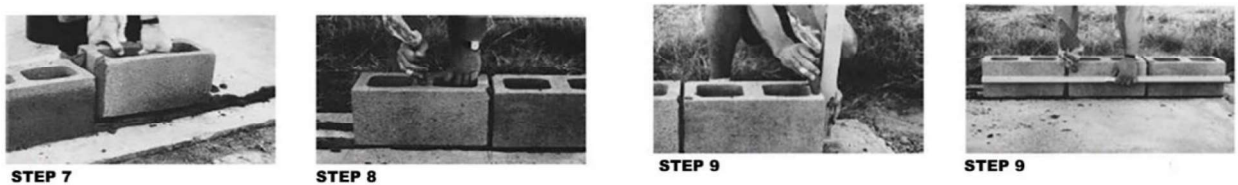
Concrete Masonry Units Steps. Source: CMA (2007)
